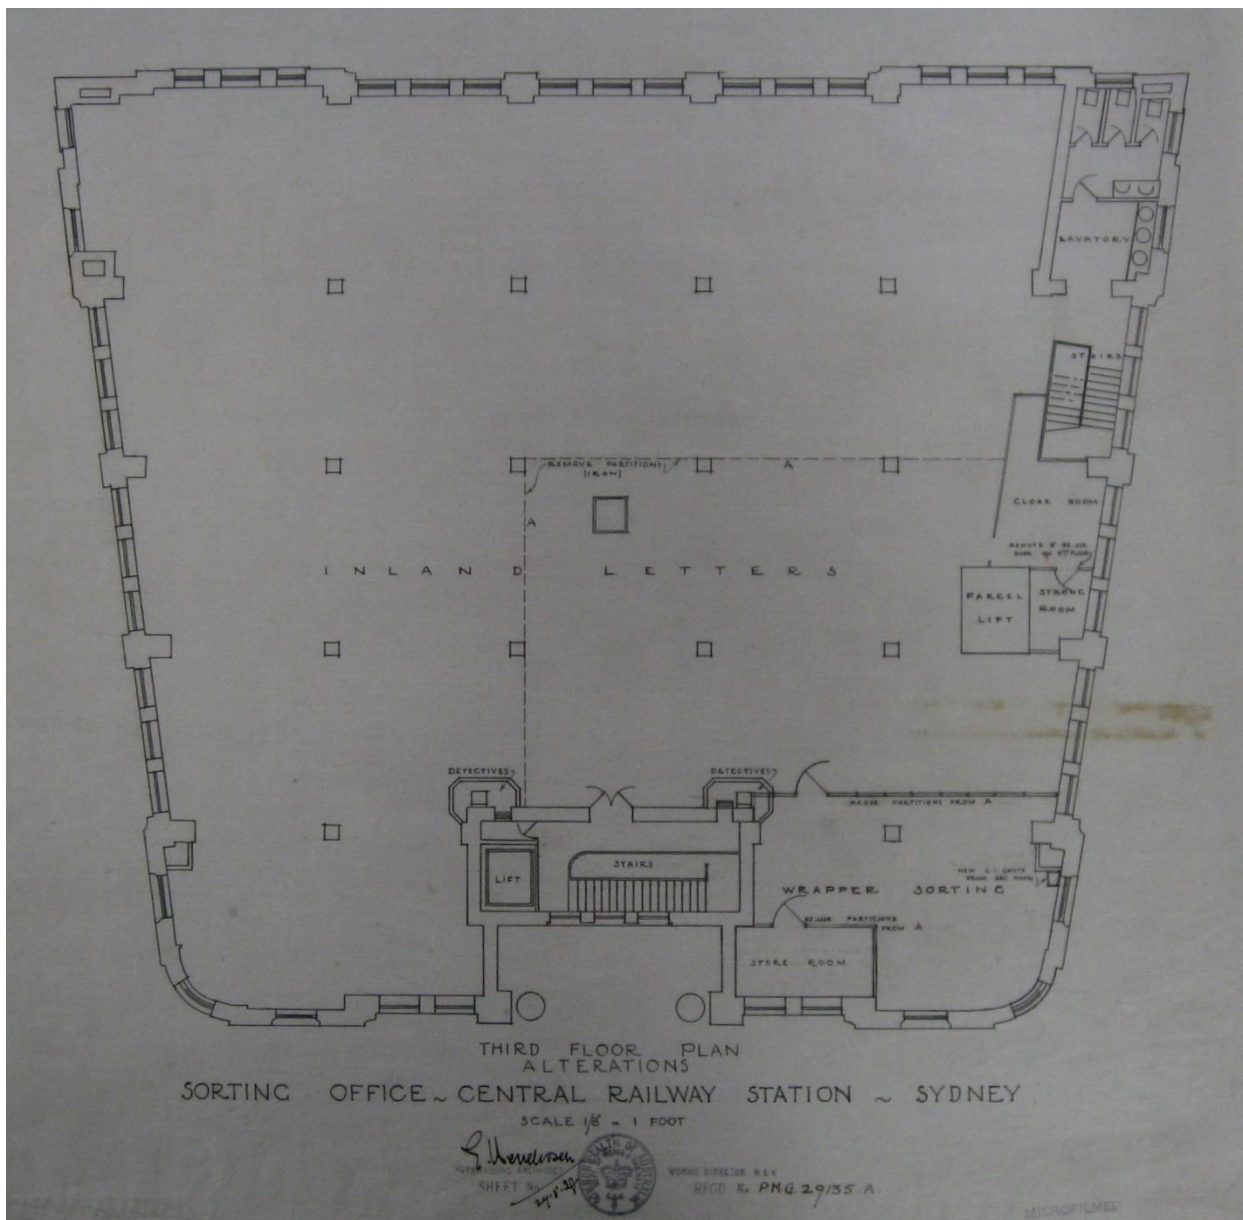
Sorting Office Central Railway Station Sydney, third floor plan alterations, 1929. Signed by G Henderson, Supervising Architect
